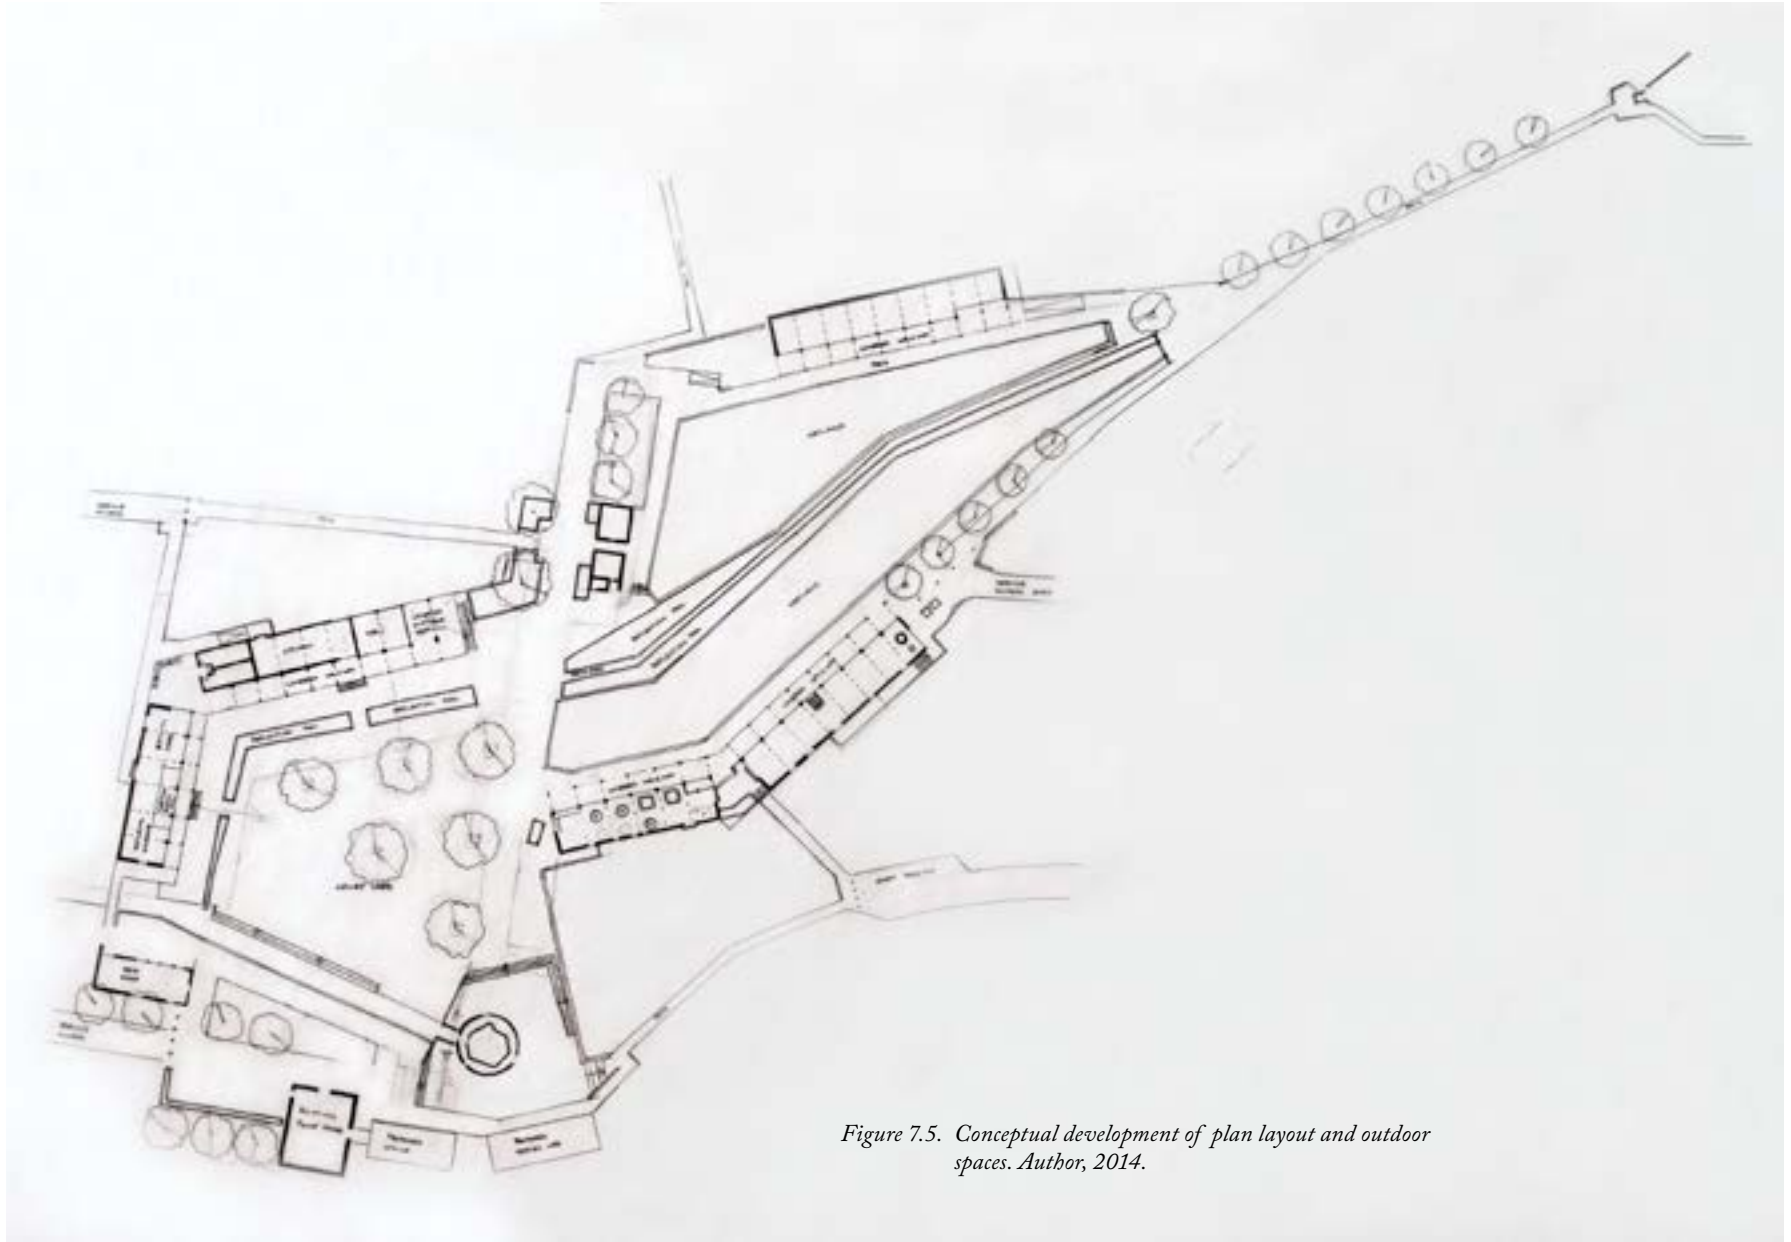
Conceptual development of plan layout and outdoor spaces. Author, 2014.
